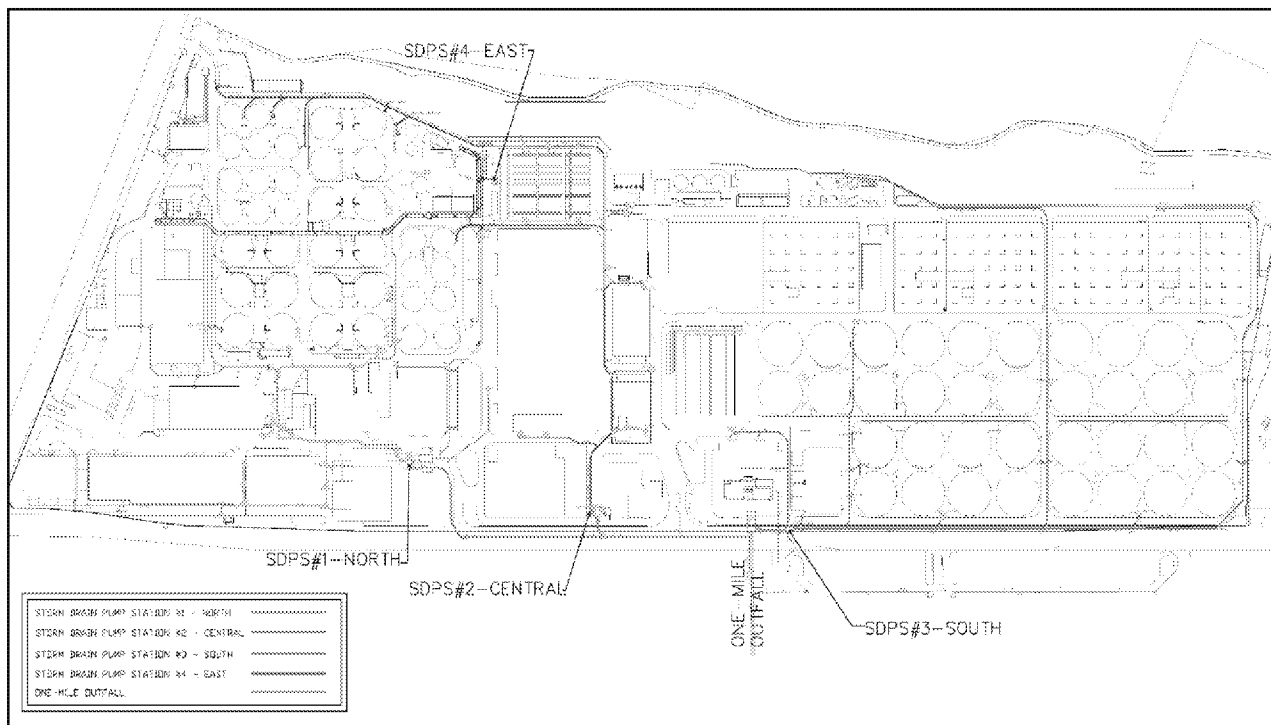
Storm Water Collection and Overflow to 1-Mile Outfall
